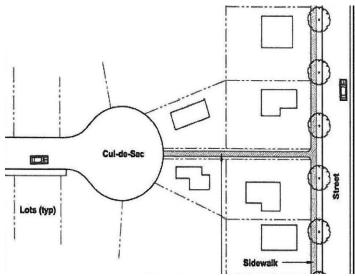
A: 10 ft. access easement from head of cul-de-sac to nearest street or path
